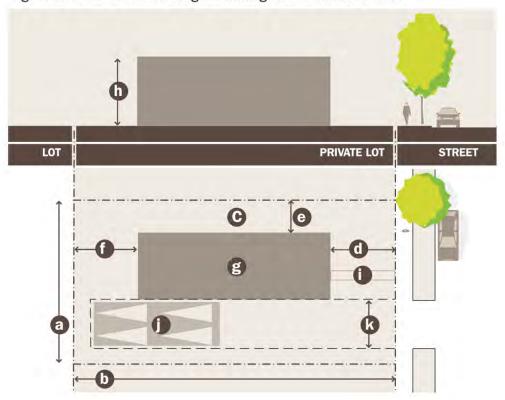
Detached Single Dwelling on Lot without a Lane
